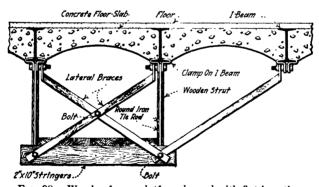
Wooden frame platform braced with flat-iron ties.
